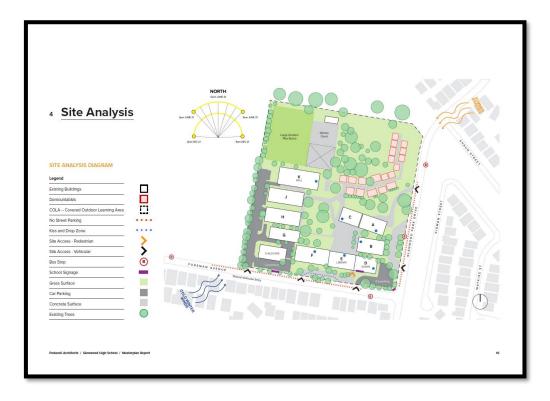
Existing site layout for Glenwood High School. (Source SINSW/Pedavoli Architects 2020).
